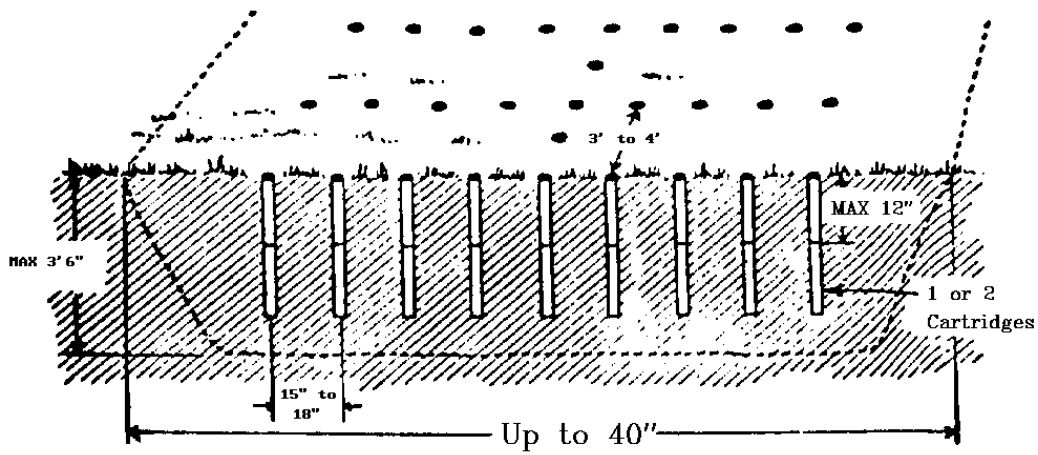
"Cross-Section Method of Blasting Ponds and Ditches".
